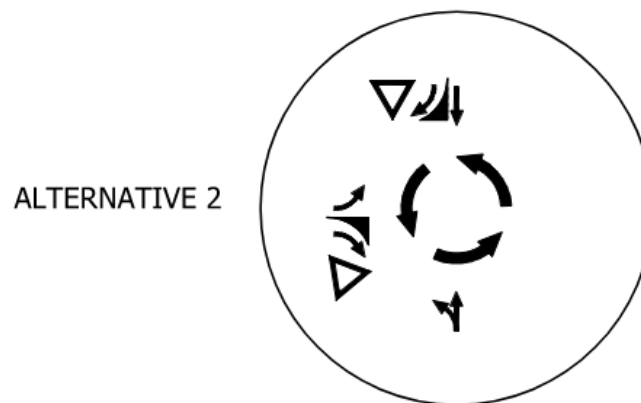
SW Stafford Road & SW Childs Road Alternative 2 – Single Lane Roundabout Lane Configuration
